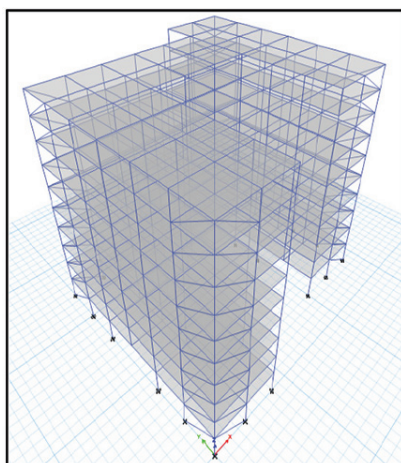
Irregular model with floating column and bracing at Type-2 location – A10
